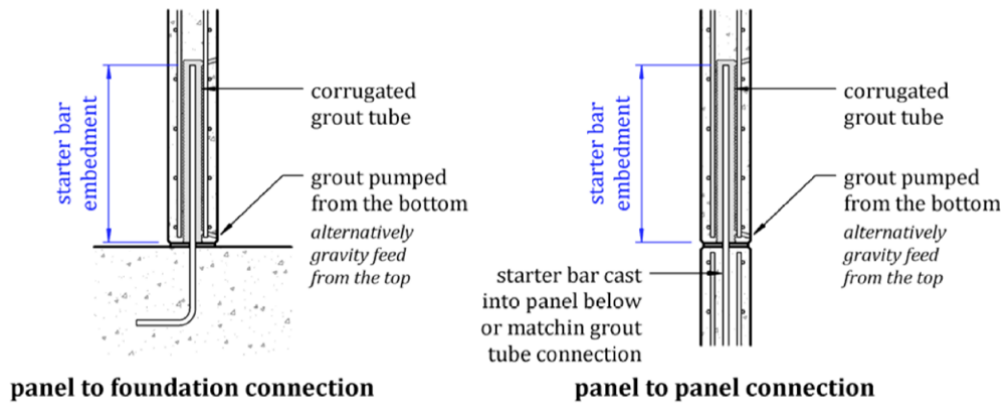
Typical grout tube connections in Australia (Menegon, 2018)
